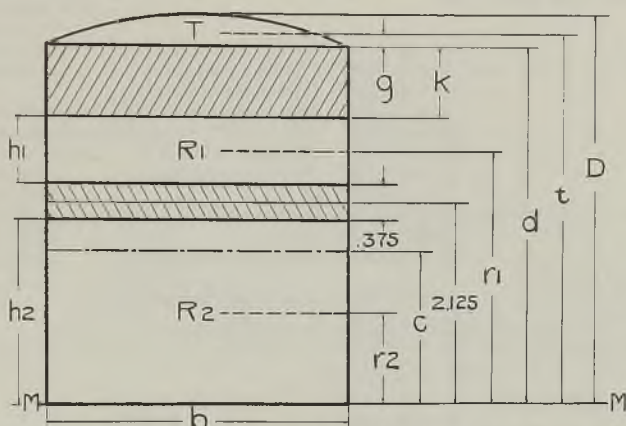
Brace bolt hole section containing a $\frac{3}{4}$ inch knot located immediately below the top segment (knot and bolt hole shaded).
